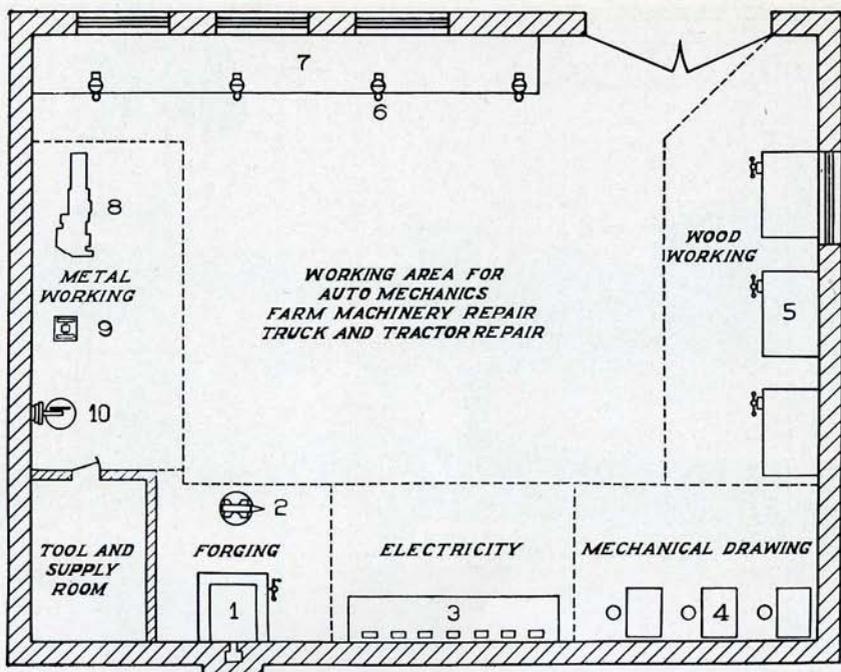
Floor Plan Layout for School Farm Mechanics Shop.
